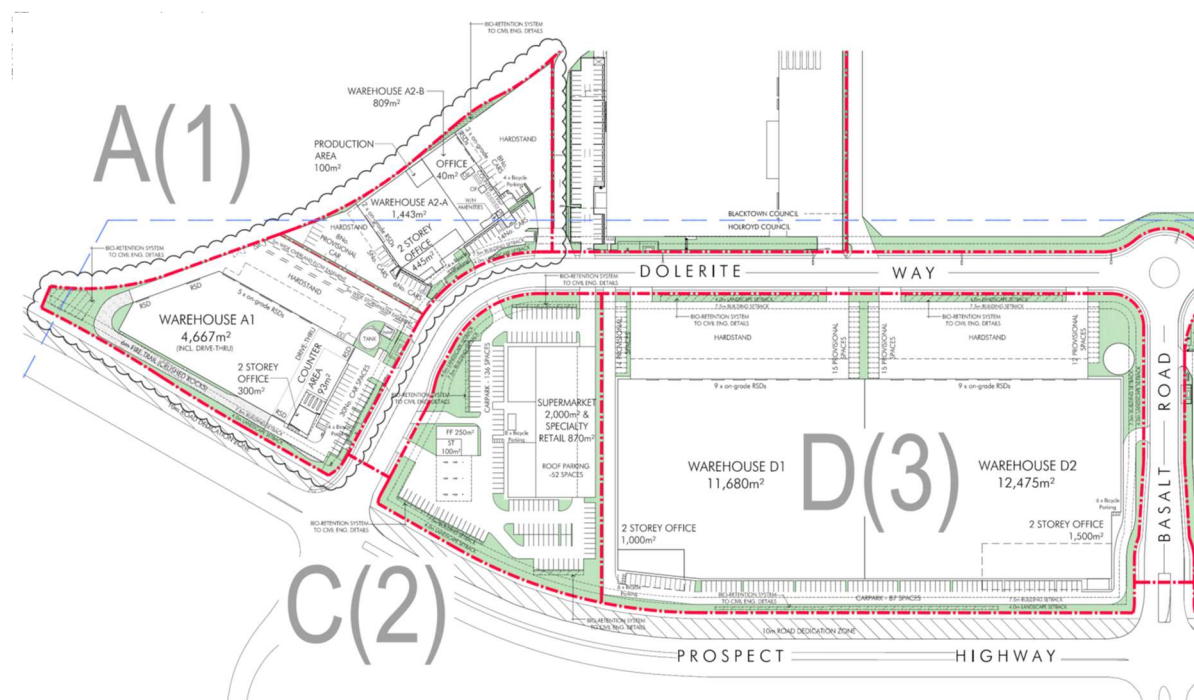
QuarryWEST Precincts C and D Site Plan – As Currently Approved
